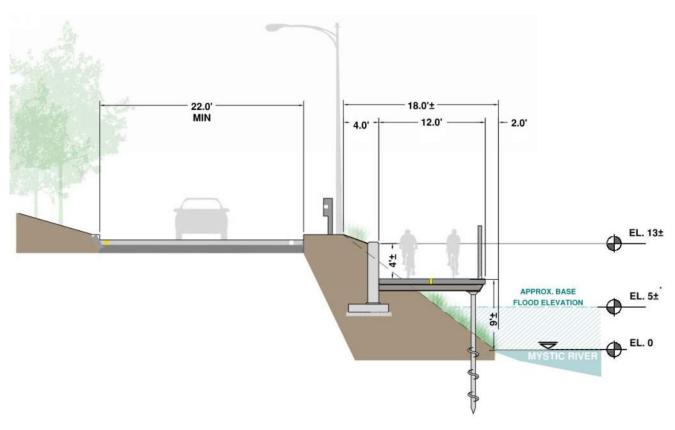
Section View of Alternative A2/A5 Hybrid - Ramp Open, Path Elevated on Piles at Mid-Height
